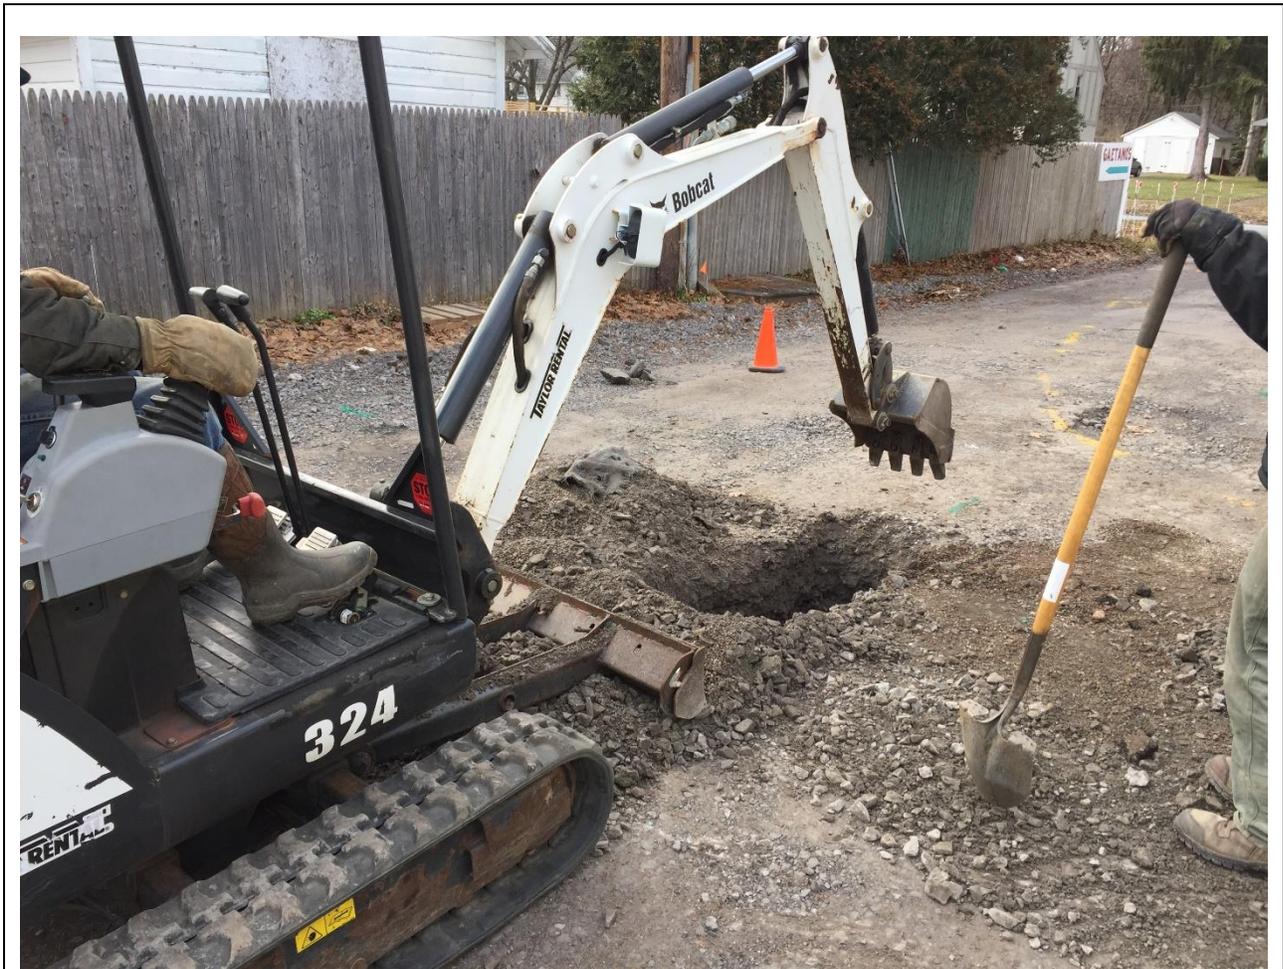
Excavation of Test Pit 2. The goal of this pit was to find evidence of a probable pipe seen with the GPR. The test pit was dug to the western edge of the original excavation, but the pipe was not found.
